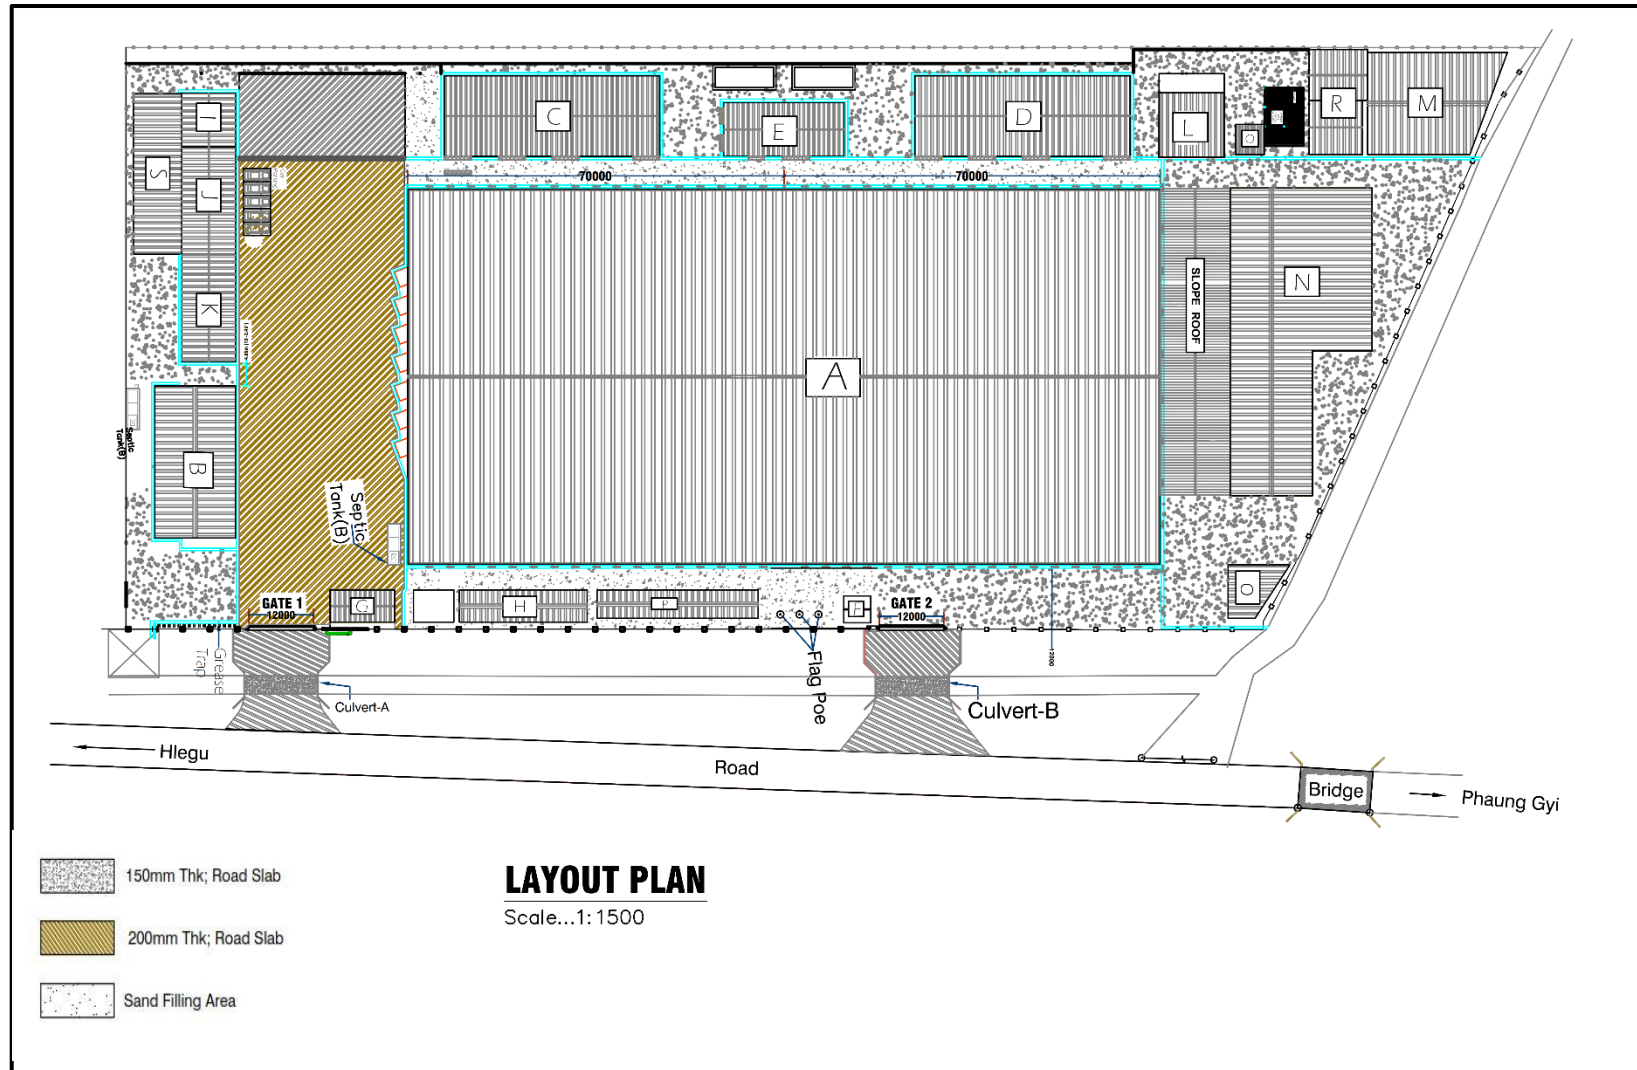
Layout Plan for Delta Mate Myanmar Bags Manufacturing Factory
